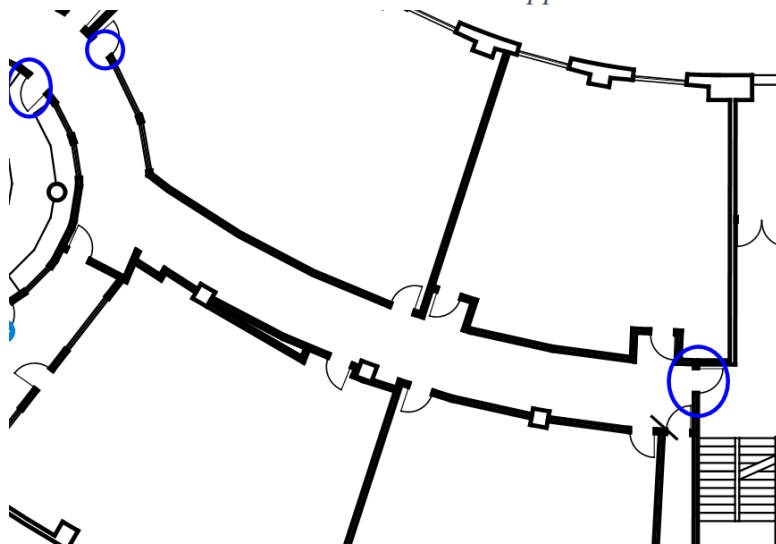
Enclosed Stair – Location of Propped Fire Door.
